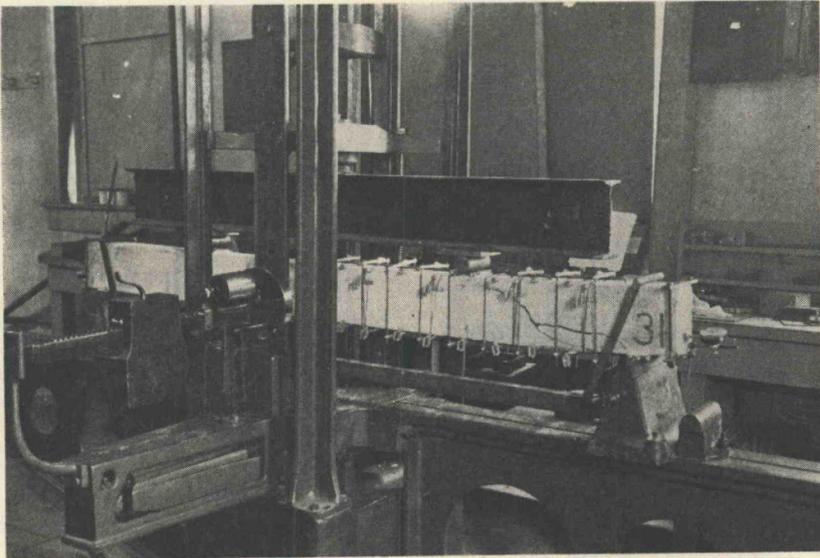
Full-Length Beam No. 31 After Test. A Typical Bond and/or Diagonal Tension Failure
